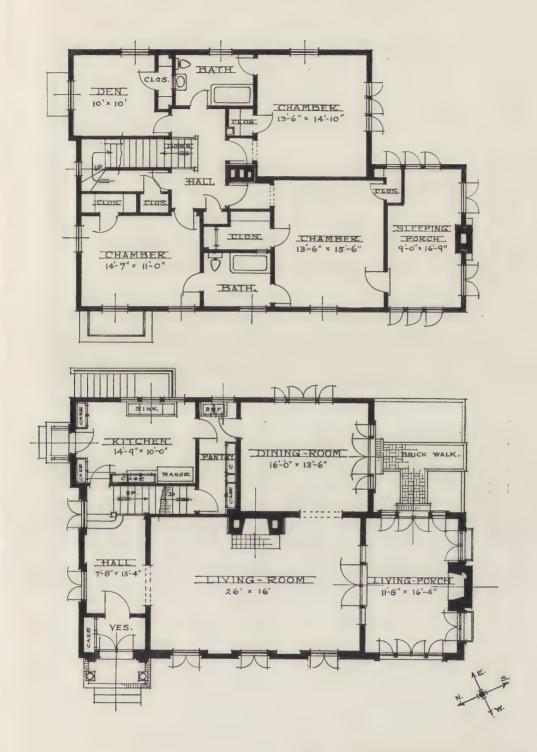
FIRST AND SECOND FLOOR PLANS—HOUSE OF HERBERT FLEMING, GLENCOE, ILL. J. A. ARMSTRONG, ARCHITECT.
